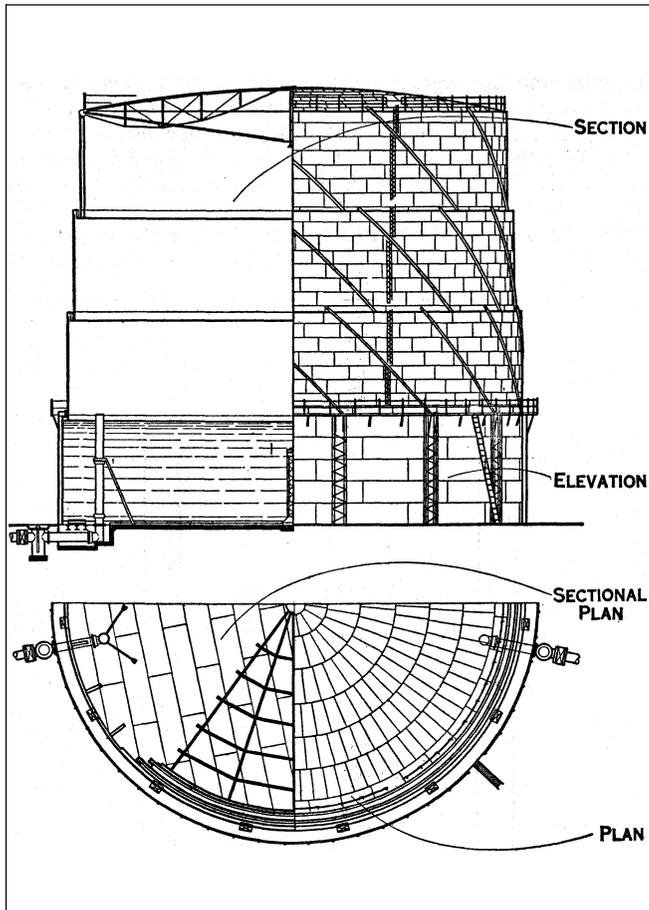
THE ELEVATION AND PLAN OF SPIRALLY GUIDED GASHOLDER
